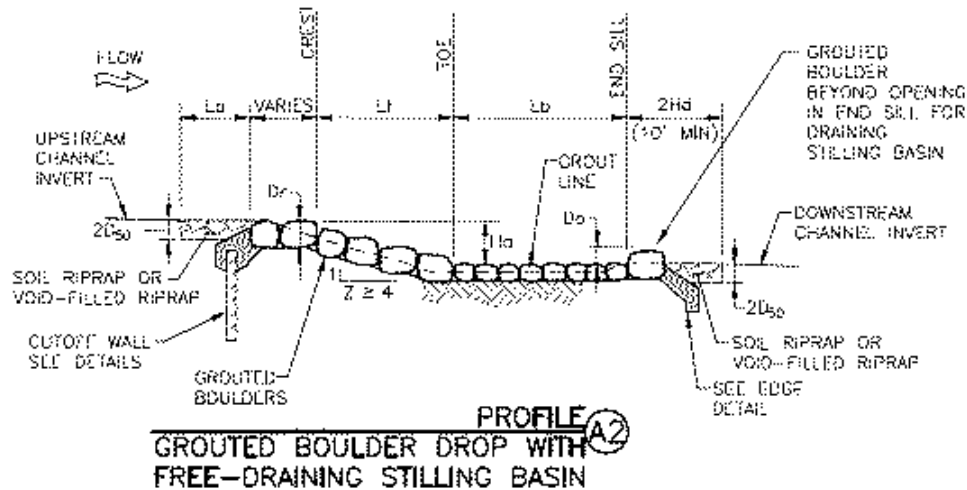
Grouted Boulder Drop Profile Drawing (MHFD, 2016)
